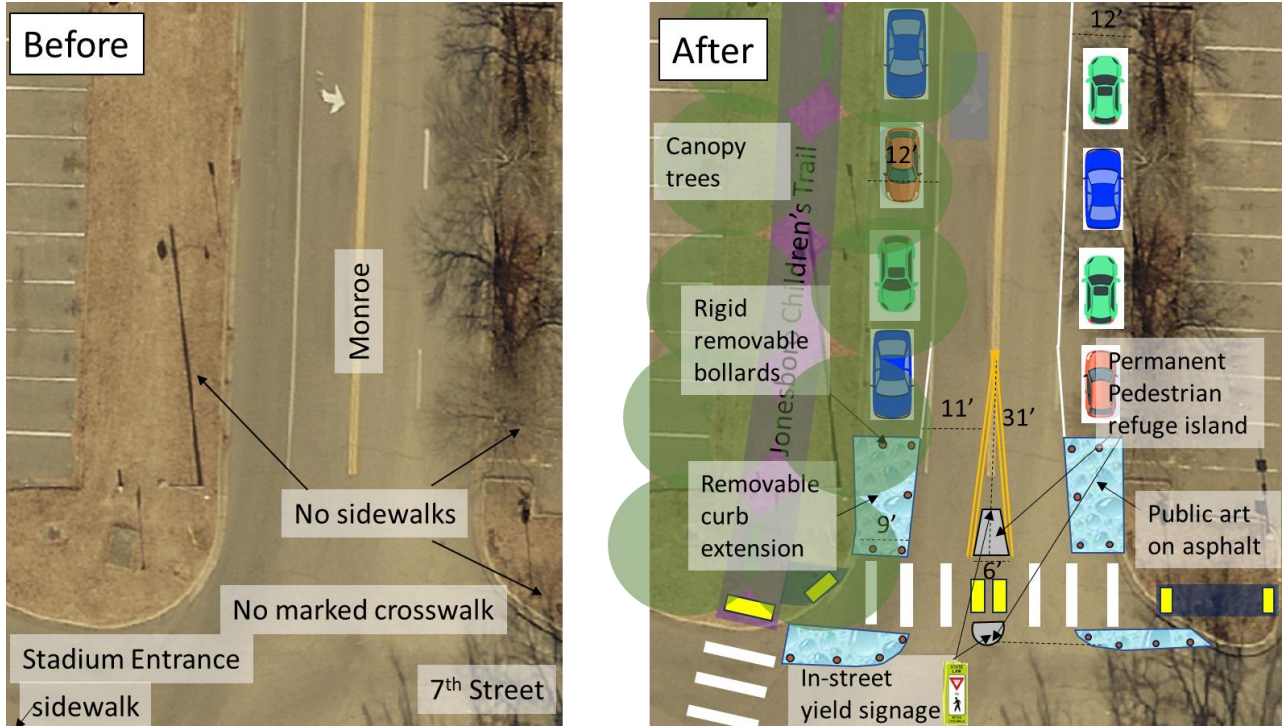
Crosswalk #5 (as defined by Fig. 1) has no existing pedestrian facilities on either side. This crosswalk, coupled with a short sidewalk on the west side to funnel pedestrians to it, would create a safer crossing of Monroe at 7th Street.
